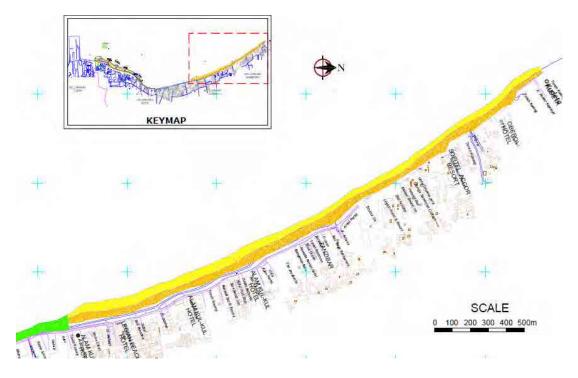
Layout Plan for Beach Nourishment at North Kuta-Legian-Seminyak (Re-posted from Chapter 11)
